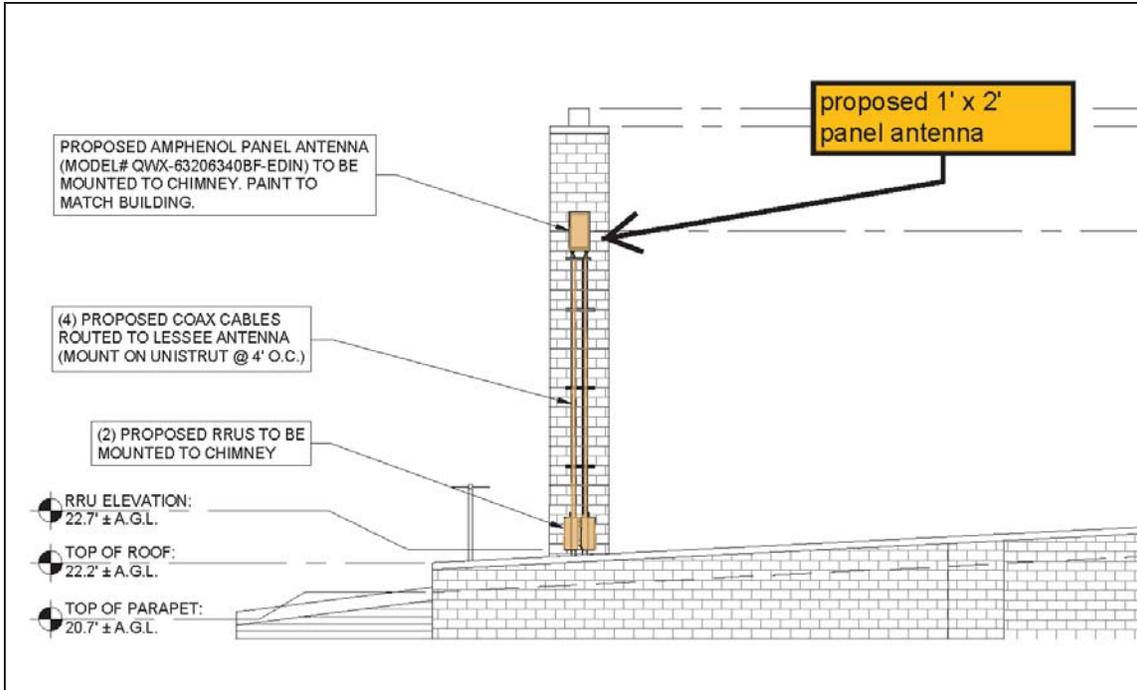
detail elevation view of current “under-build” proposal (looking north)
